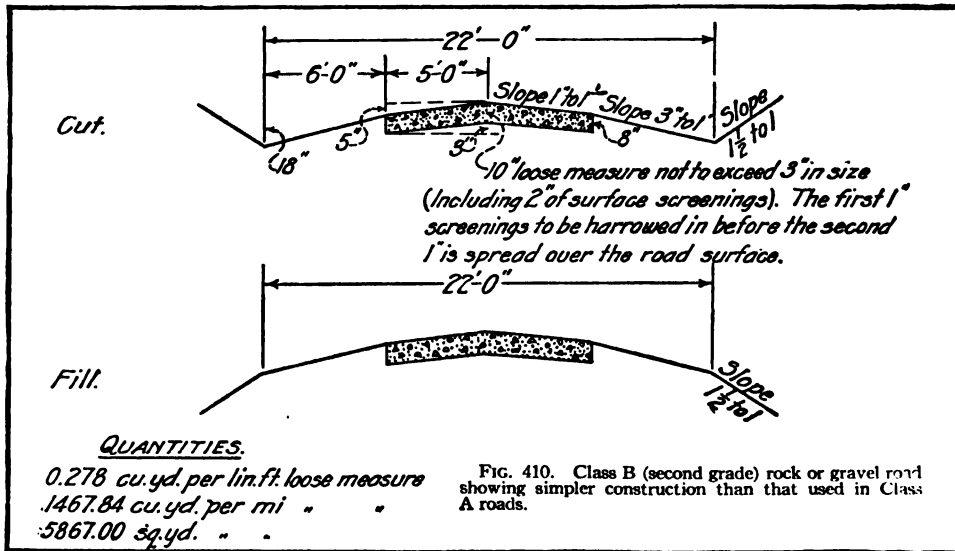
Class B (second grade) rock or gravel road showing simpler construction than that used in Class A roads.
